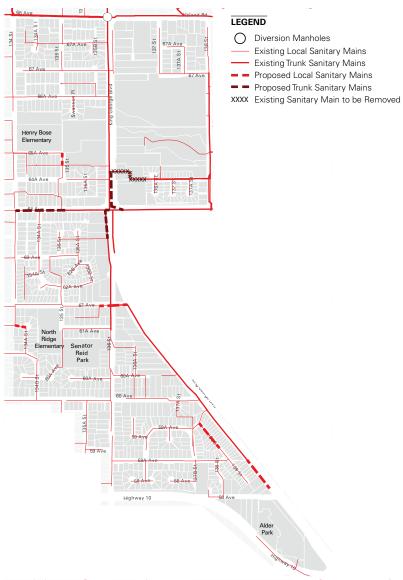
A SANITARY UPGRADES OUTSIDE OF PLAN AREA
